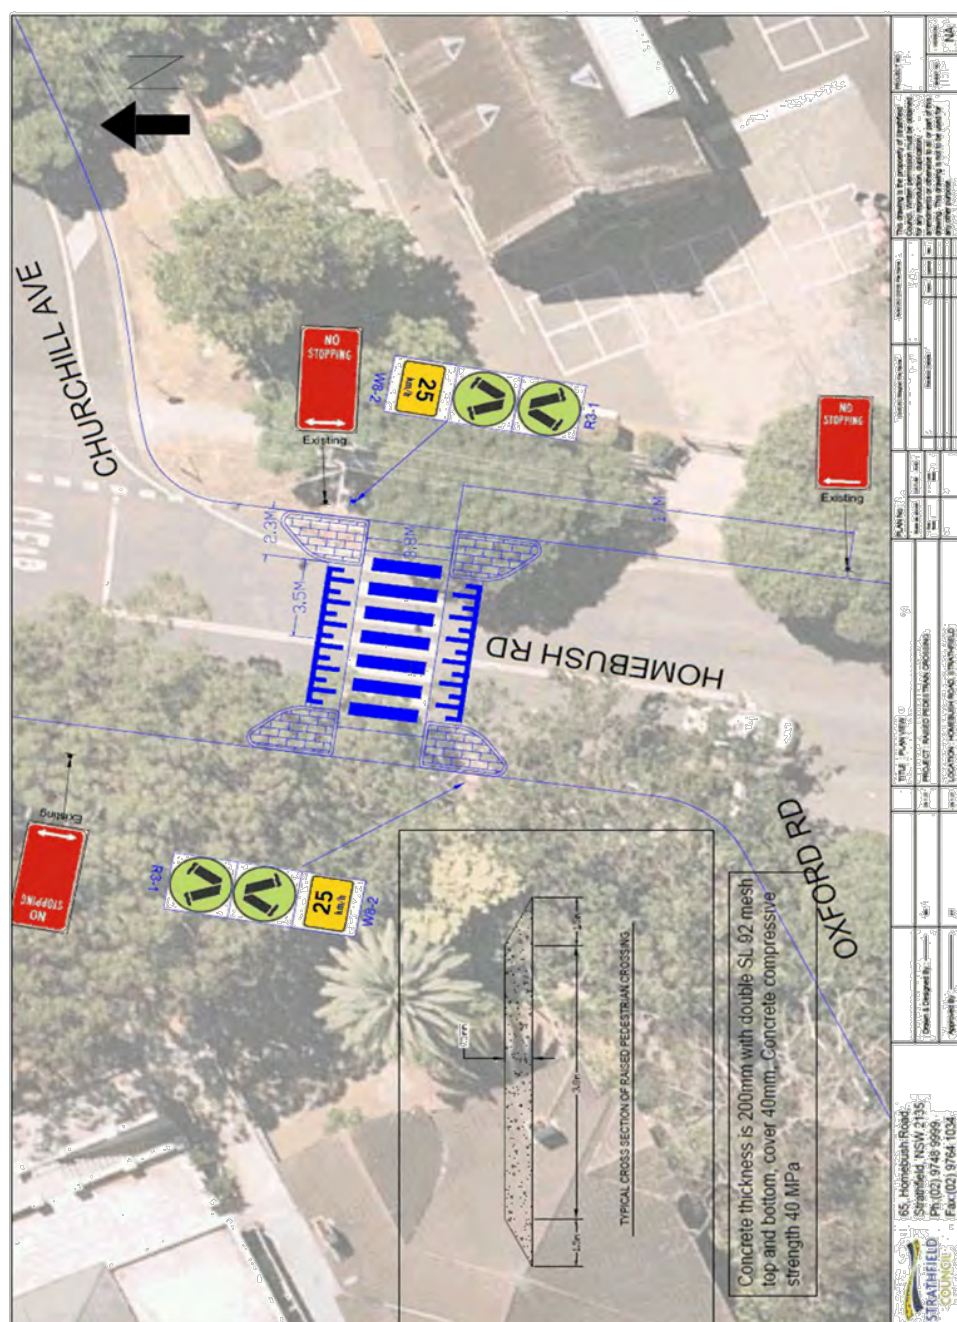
Proposed Raised Pedestrian Crossing in Homebush Road
